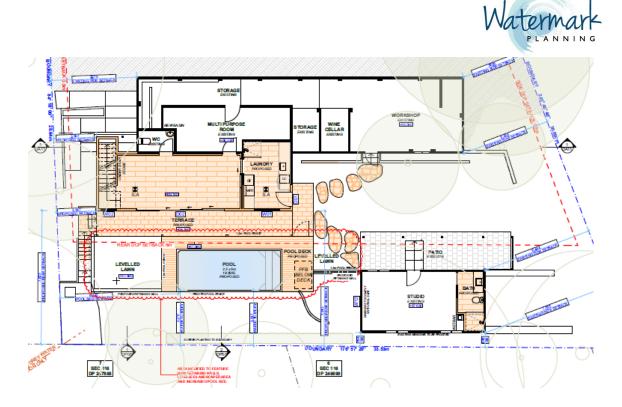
Extract of Proposed Lower Ground Floor Plan (MOD06) - area to be modified in red bubble
